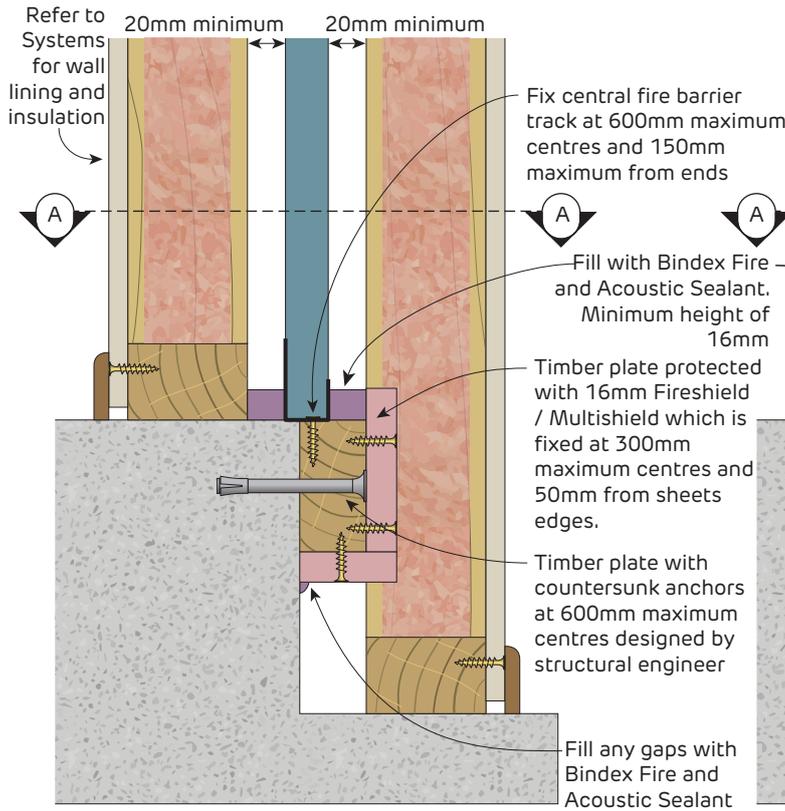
Interhome Wall Base to Slab with Step-Down and Timber Plate
